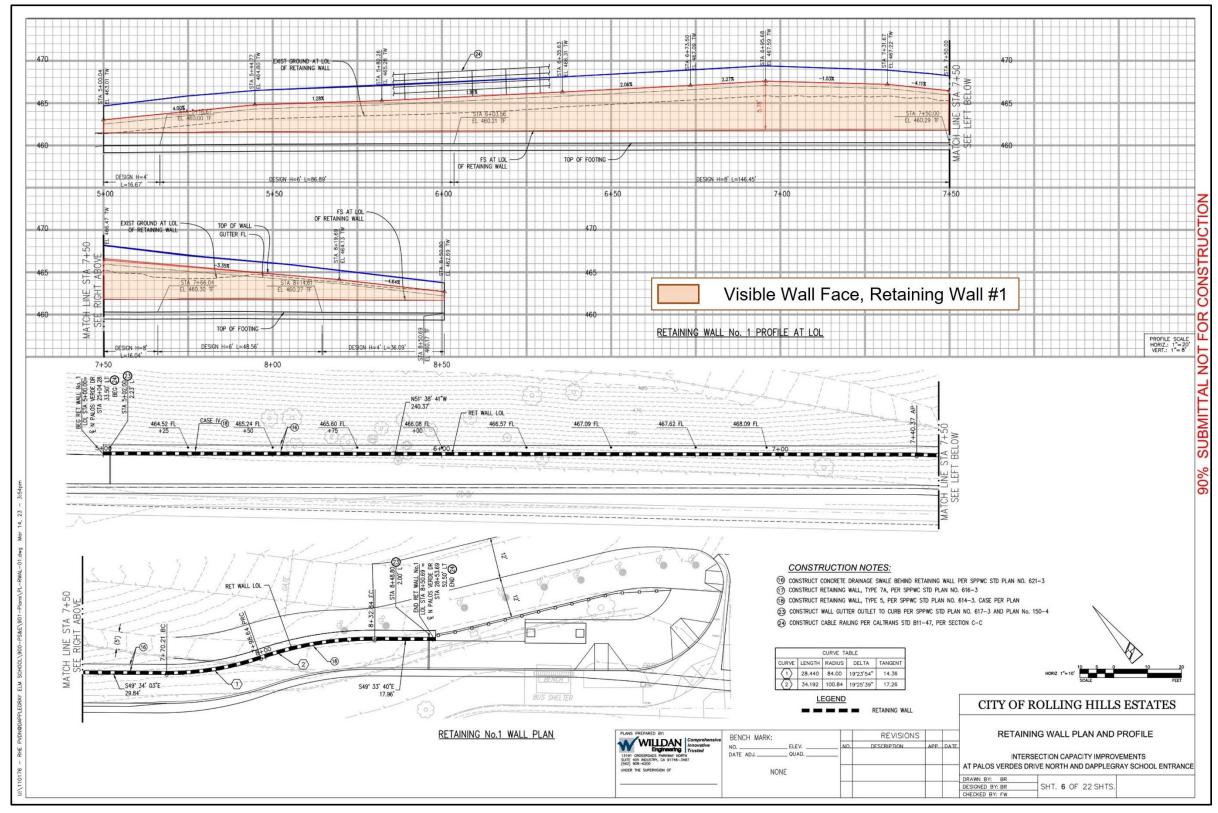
Retaining Wall No. 1 (Schematic Illustration)
